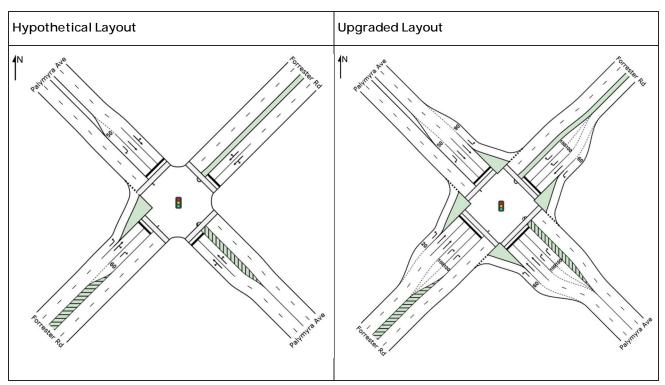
2026 with Links Road extension - Palmyra Avenue/Forrester Road
